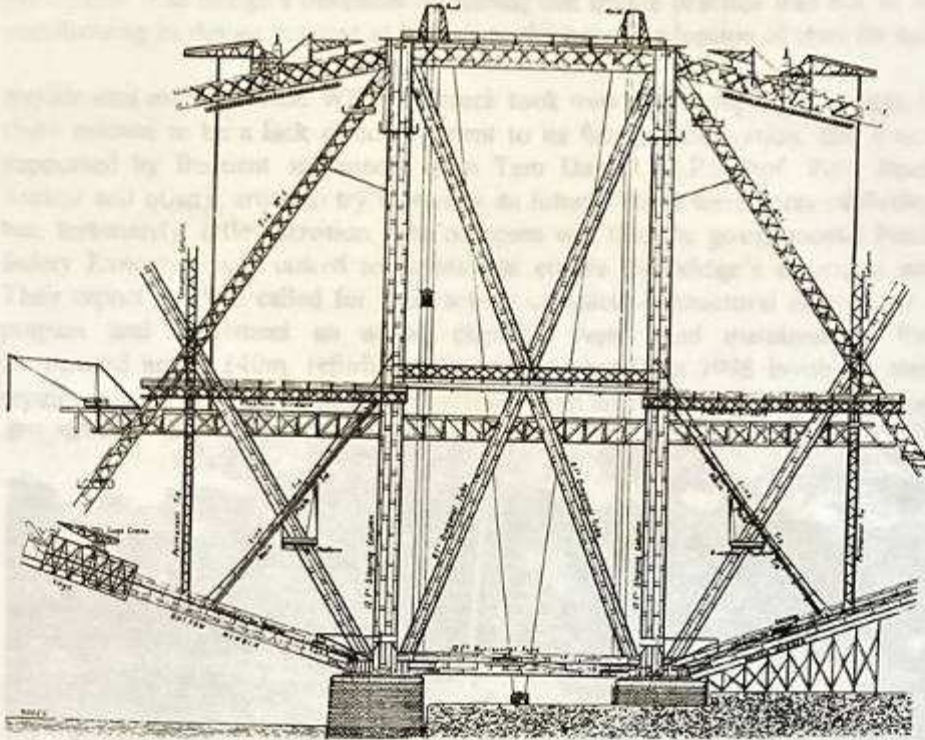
Cantilever erection. Note "Jubilee" steam and hydraulic cranes on top(1).
